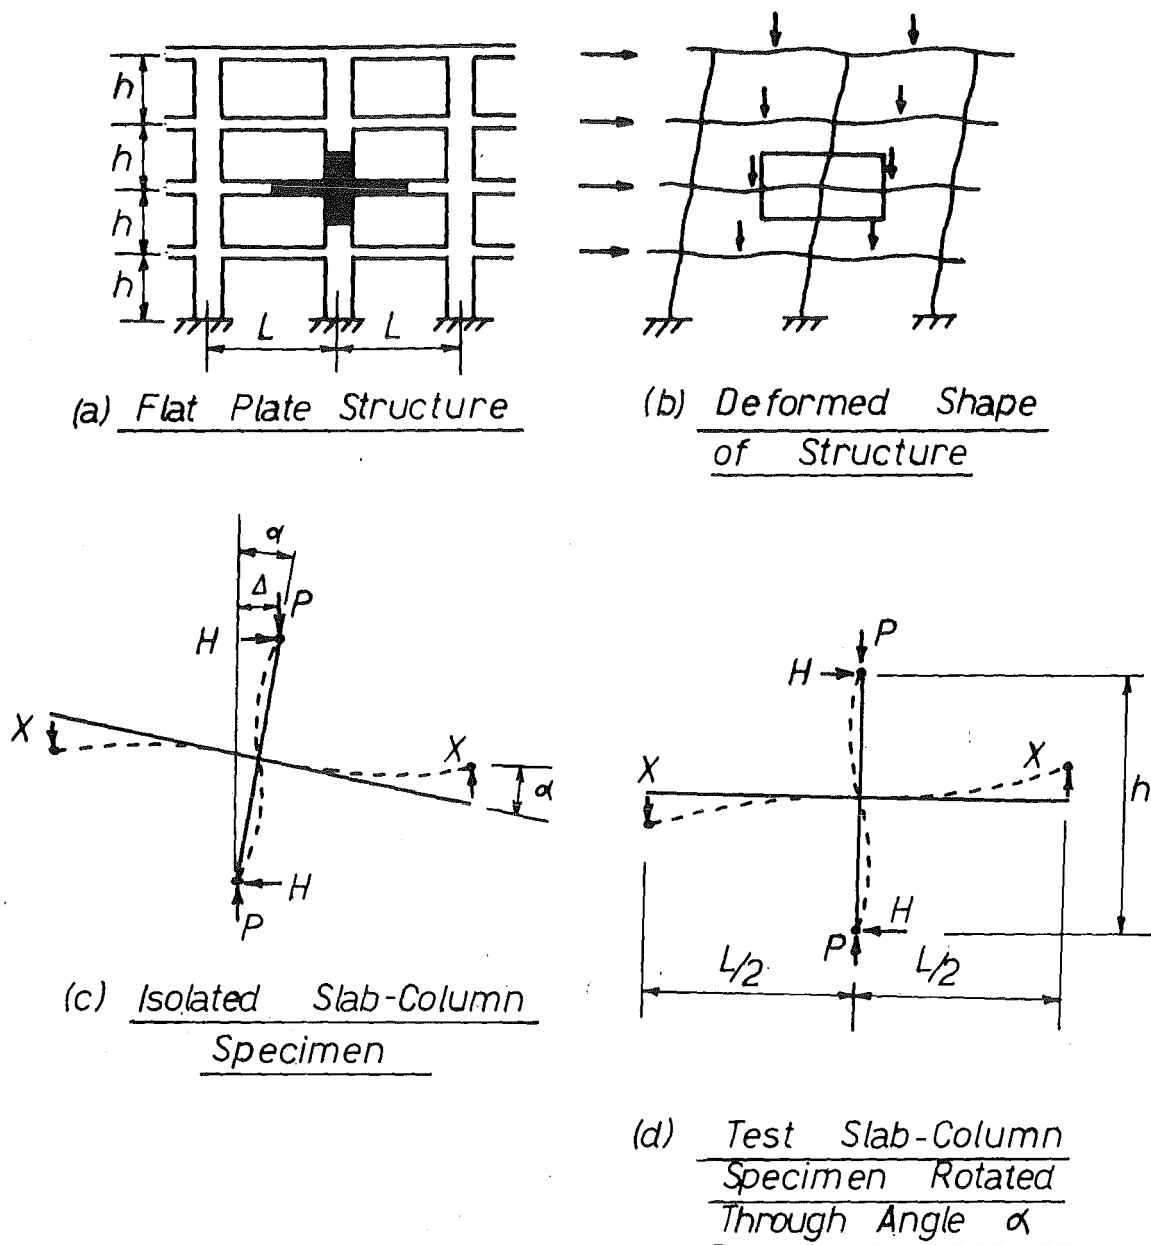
SELECTION OF SLAB-COLUMN TEST SPECIMEN
